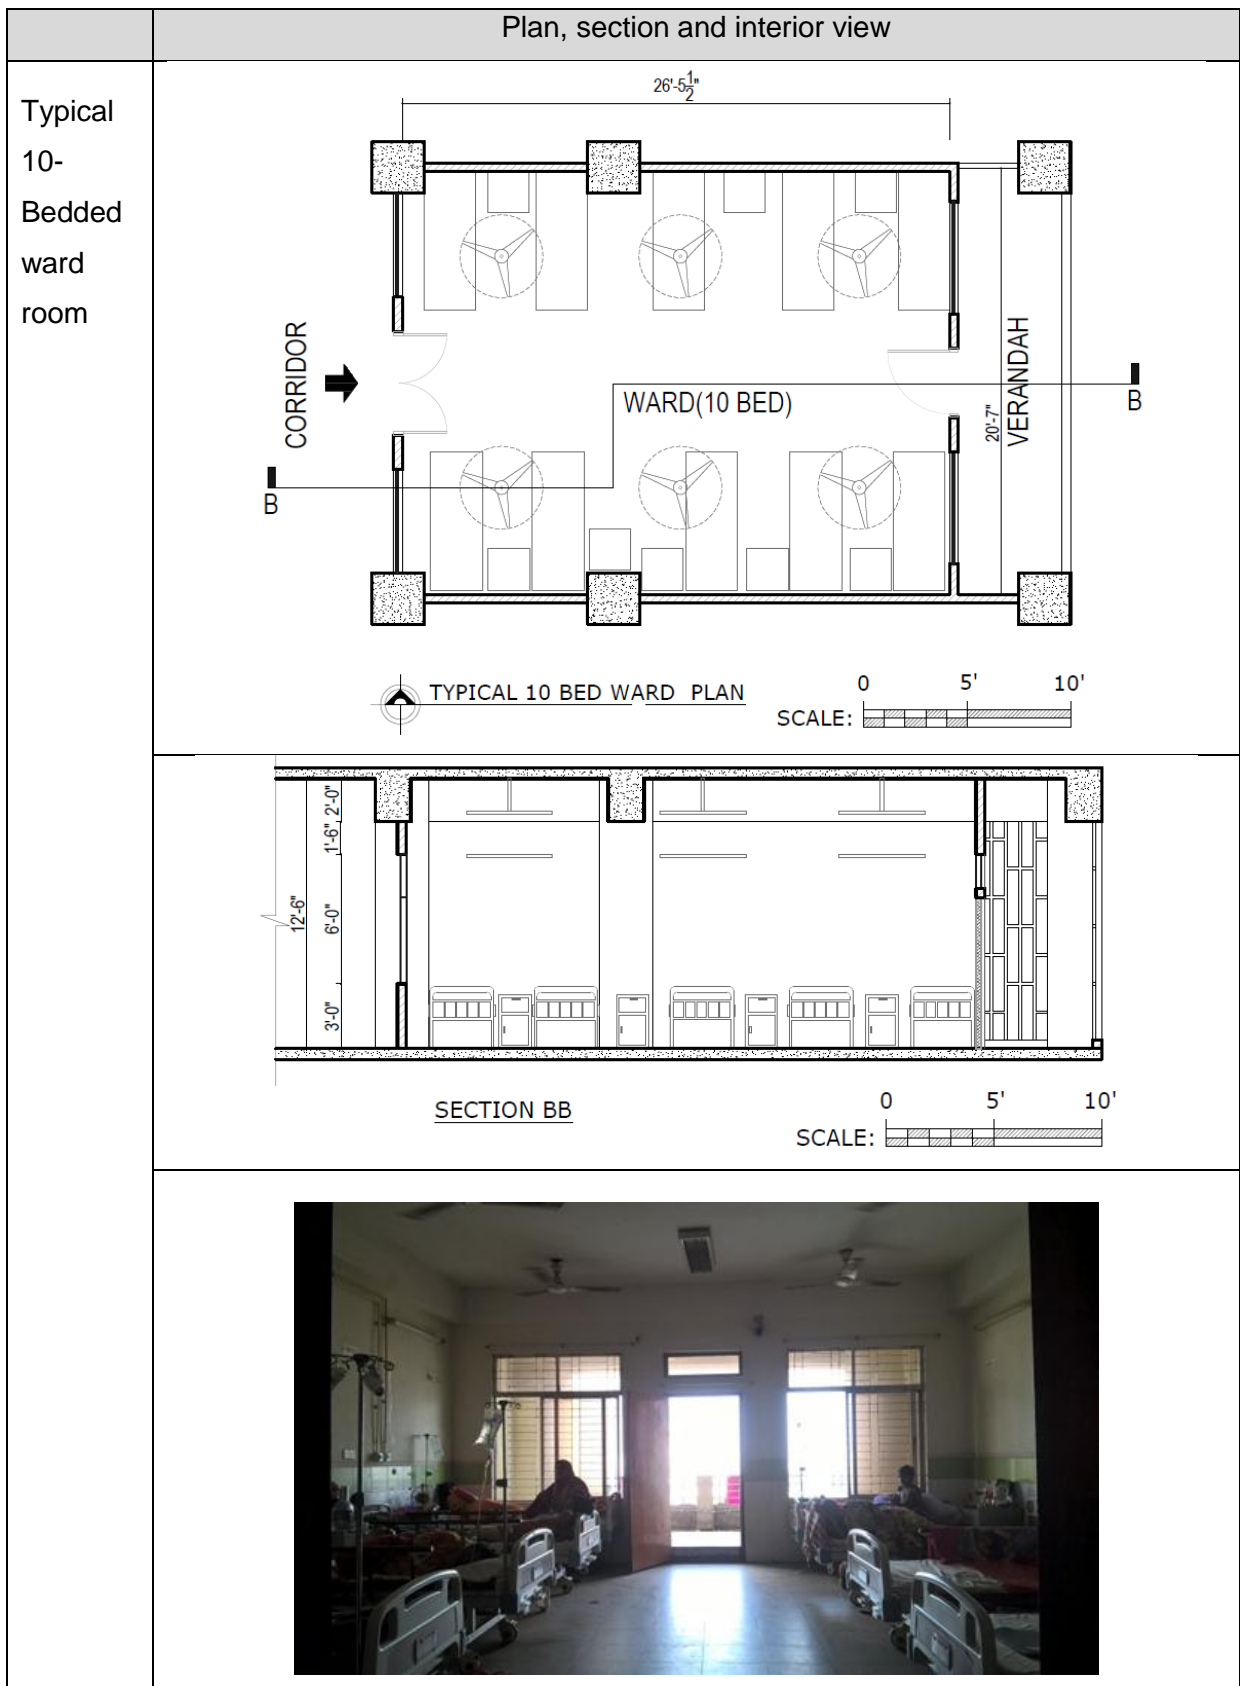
Plan, section and interior view of ward rooms with 10 beds
